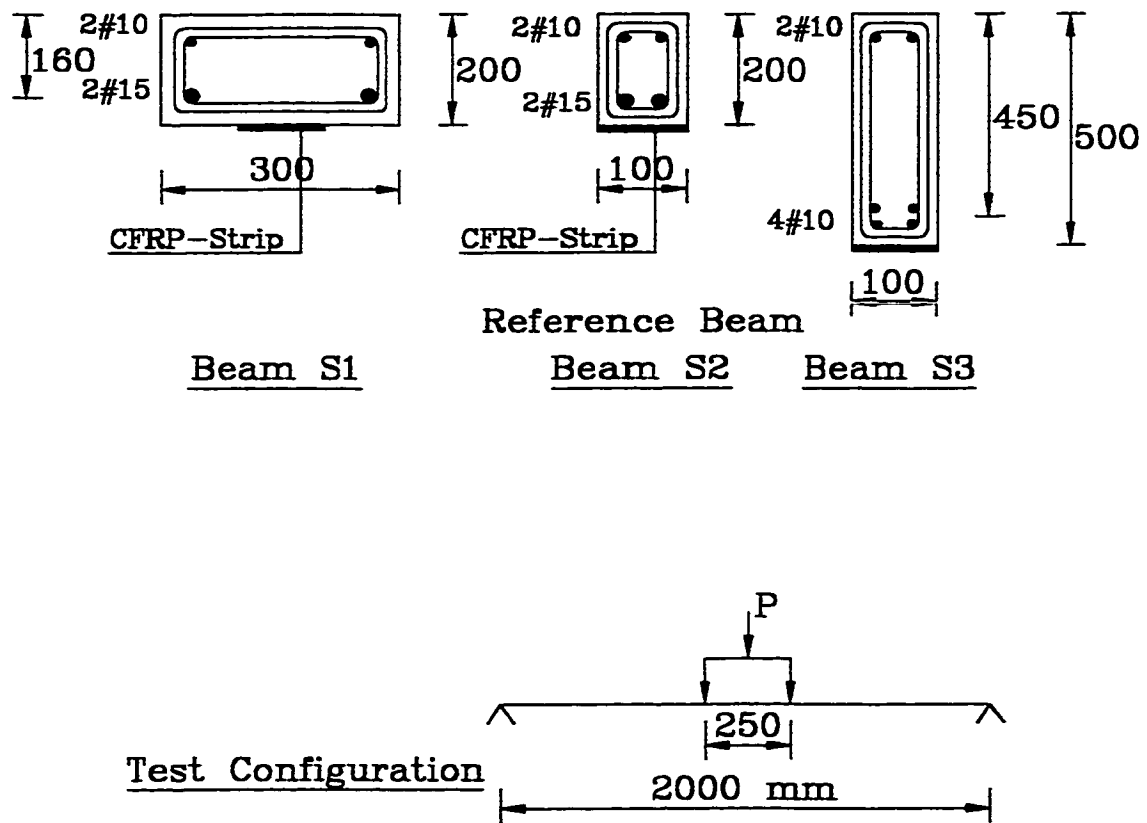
Cross-sections of Beams S1, S2 and S3 and Testing Configuration
